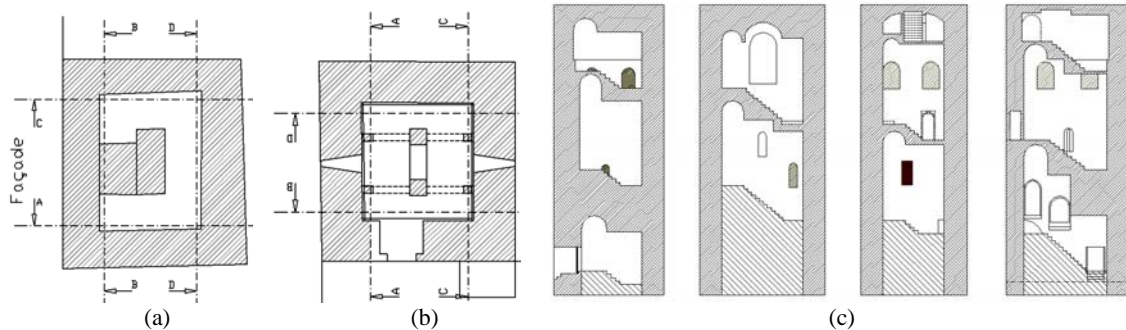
Partial sections of the towers: (a) horizontal section of the South tower, (b) horizontal section of the North tower and (c) sections A-D for the South tower.
